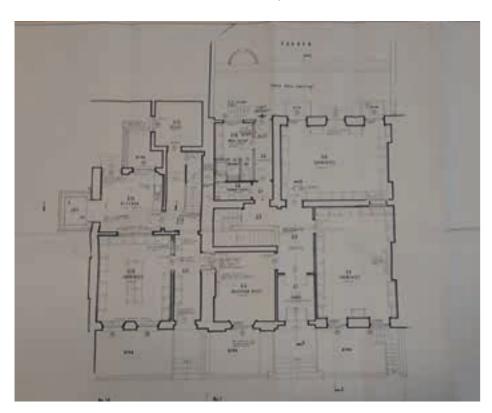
Ground floor plan of the properties in 1984 showing proposed internal alterations
